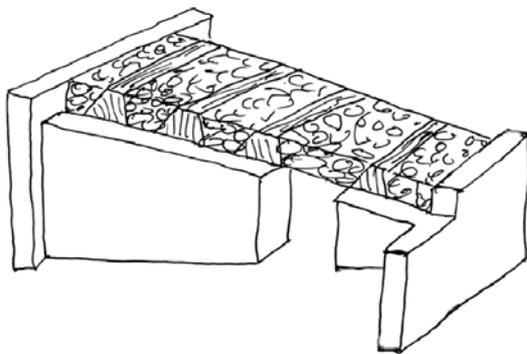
Two-way timber-masonry vault construction typical of the Italian alpine province of Sondria and the adjacent Swiss Poschiavo Valley. (Dooley)
